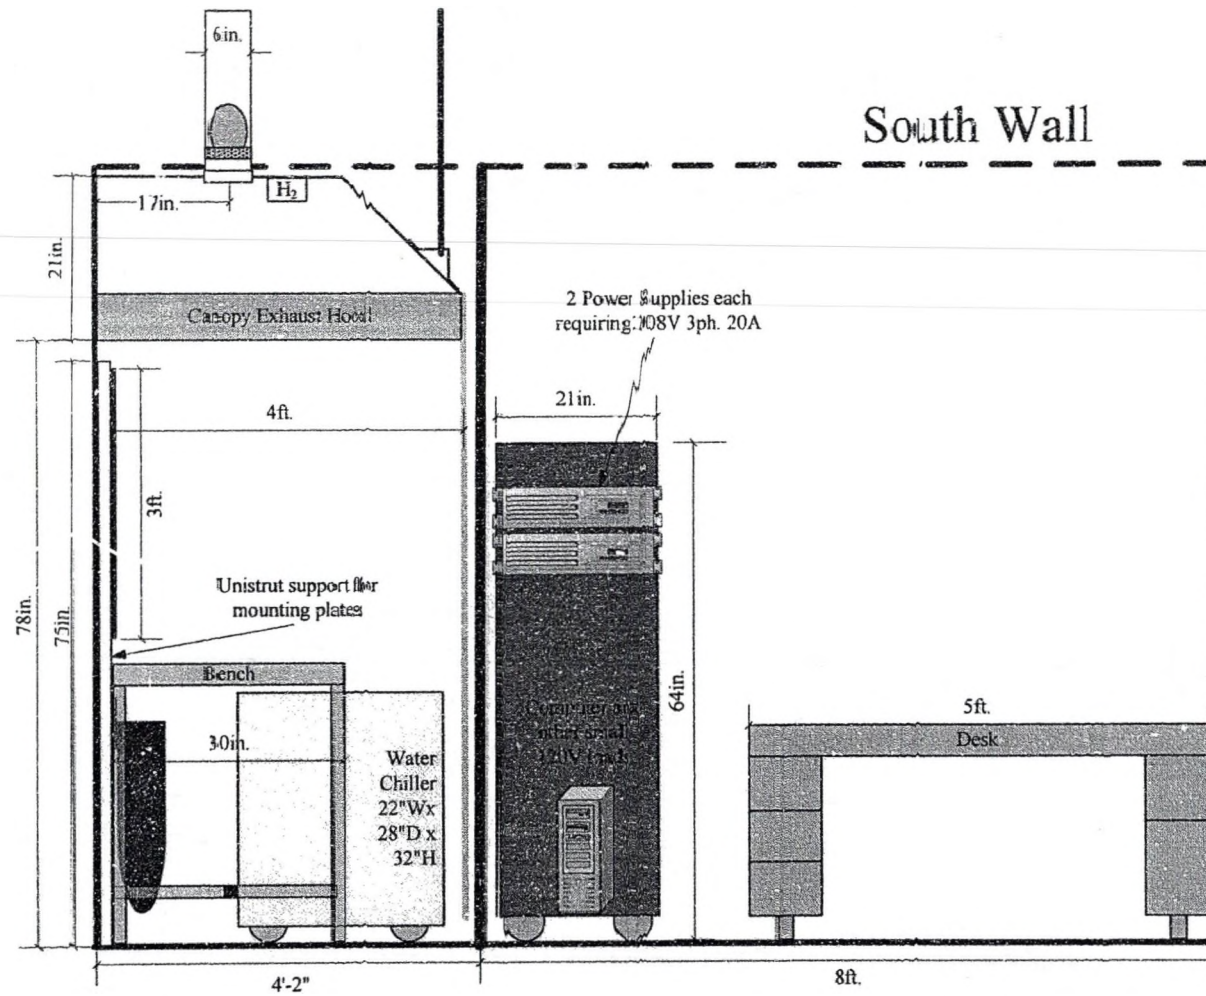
Upson 360A south wall with desk, instrument rack and canopy hood.
